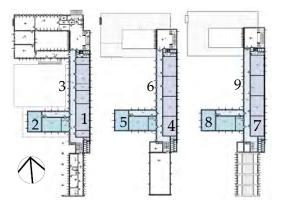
Floor plans of the building, from left to right: ground floor, first floor, second floor. The subject of this investigation: eastern classrooms, southern classrooms, and the corridor with the service areas are highlighted in different shades of blue
